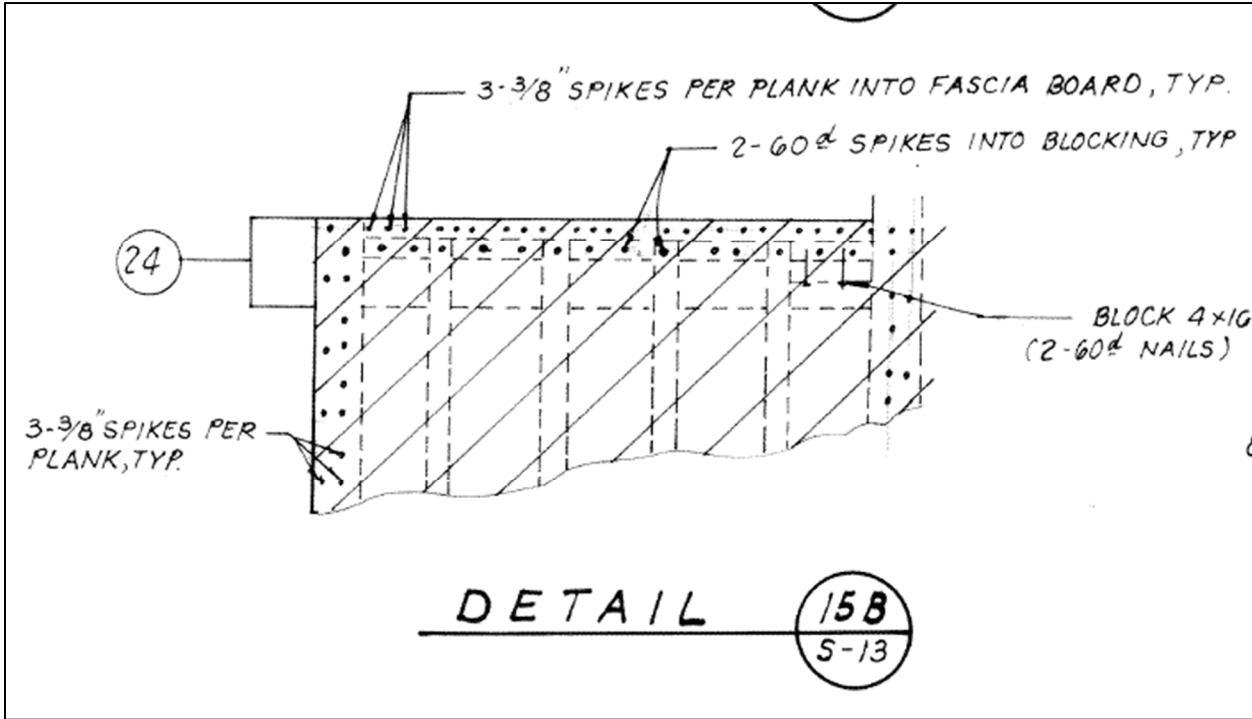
Reference Detail 15B on S-13. For fastening of deck to stringers at the popout.
